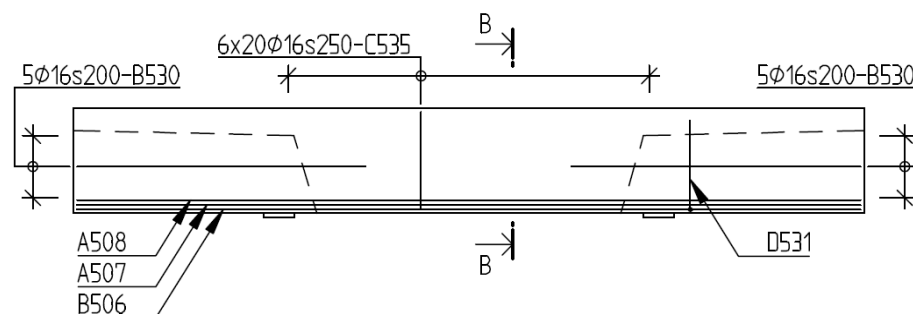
Section A-A of reinforcement arrangement in the FE-model, [mm].
